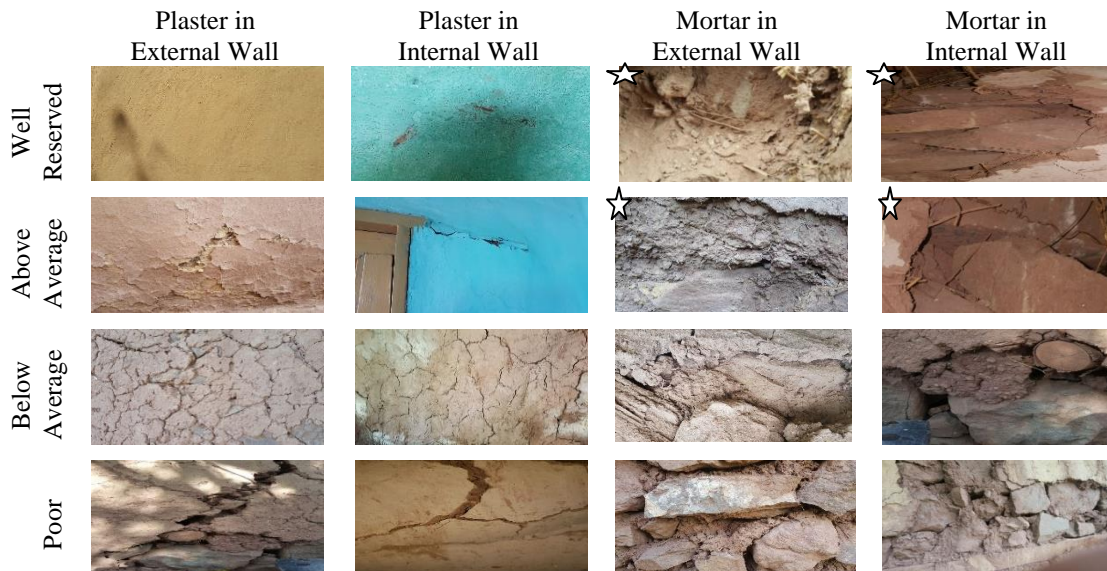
Observed cracking pattern in plaster and mortar of exterior and interior walls
